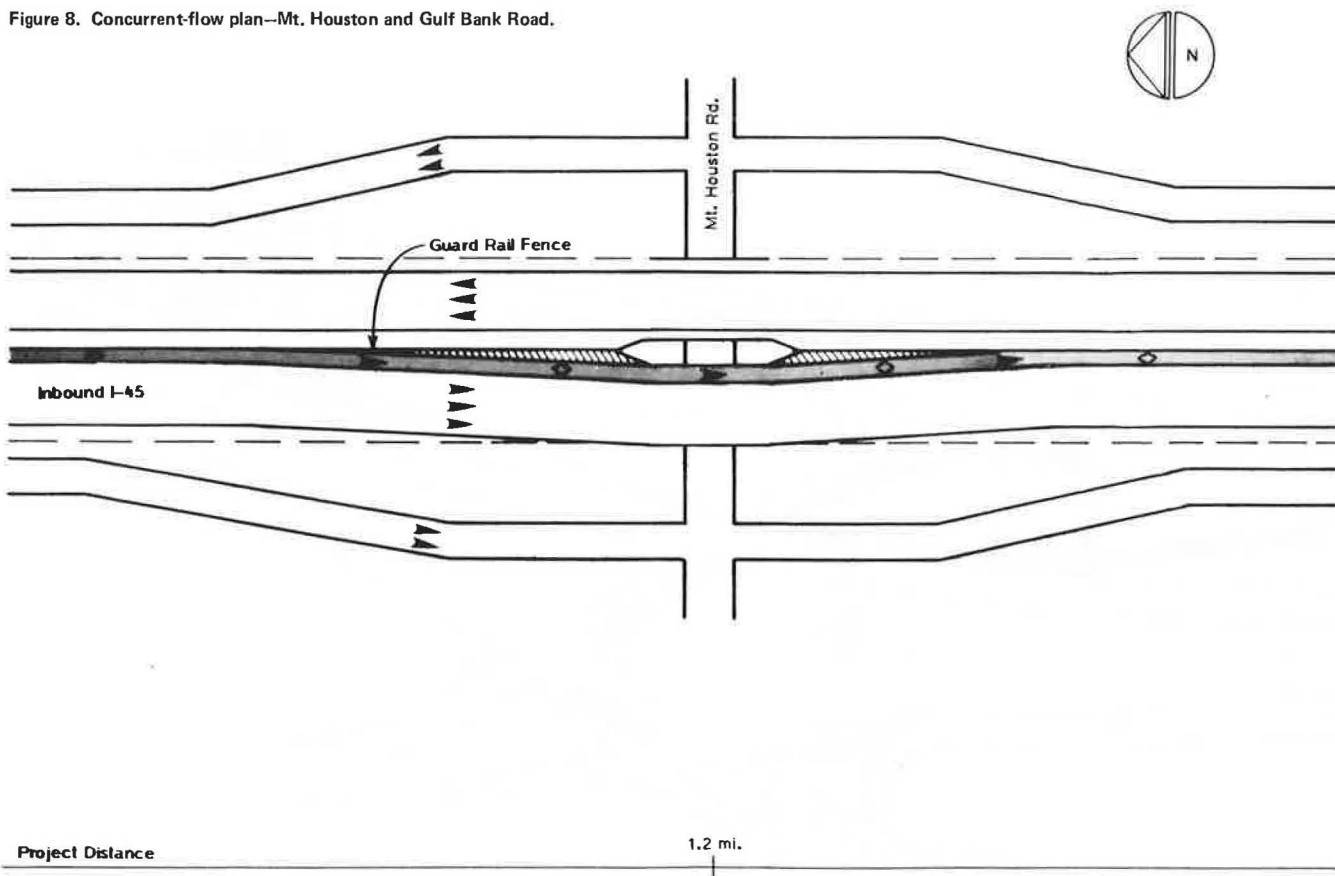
Concurrent-flow plan—Mt. Houston and Gulf Bank Road.
